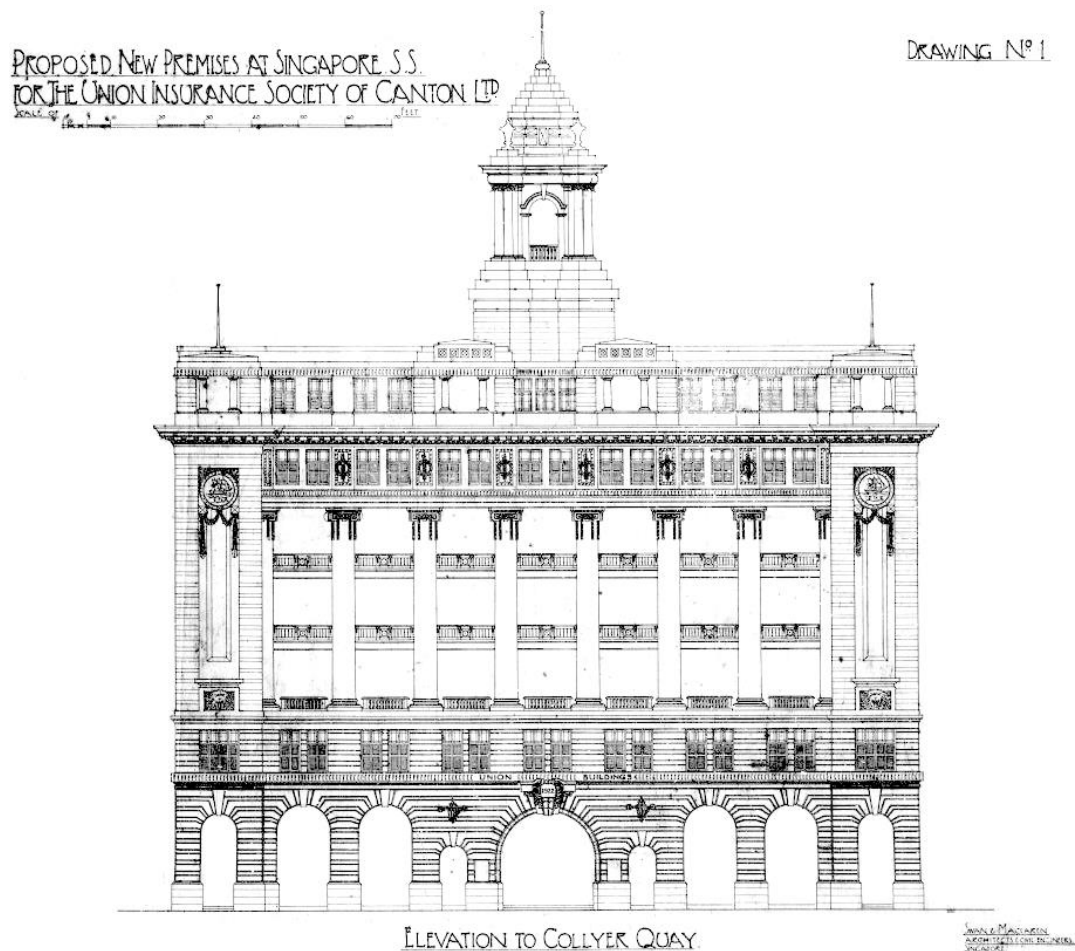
Denis Santry of Swan & Maclaren. Union Insurance Society of Canton Building, 1920. NAS NA 309, Building Plan 18(1).
